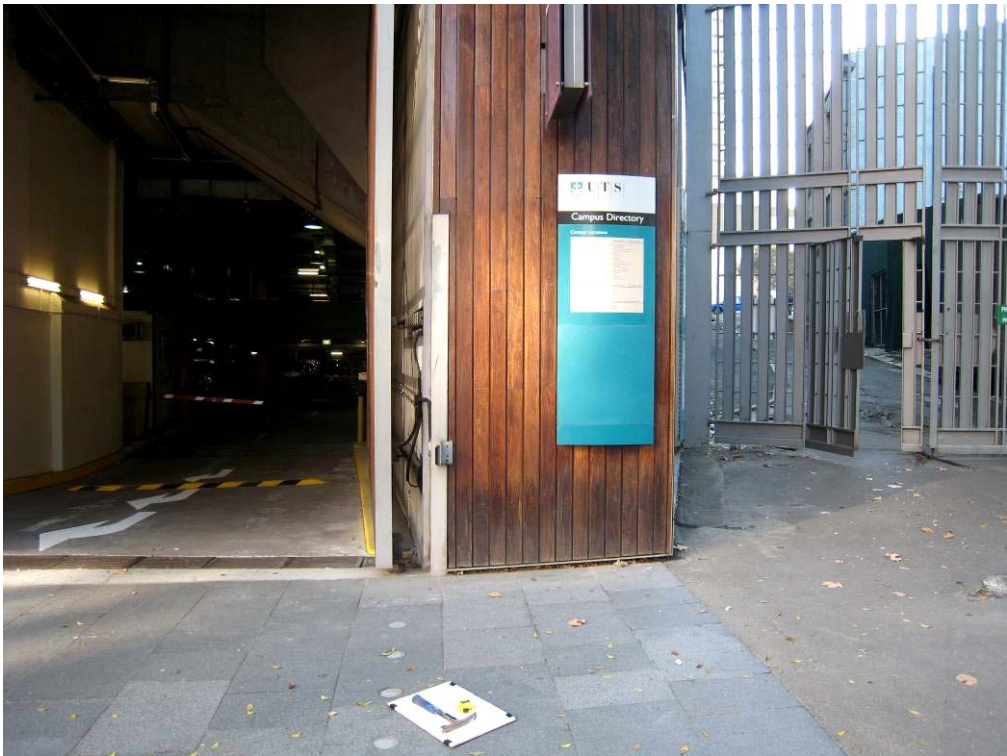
View looking east into neighbouring basement of UTS Building CB10 to the north from Wattle Street.
